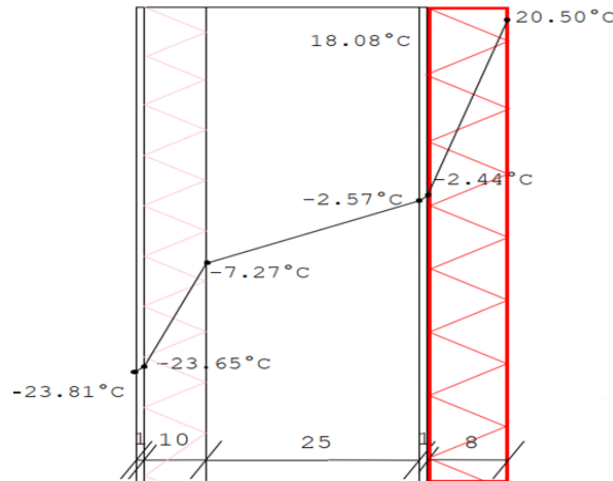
Display of heat loss through the wall layers (after additional thermal insulation, cork)
